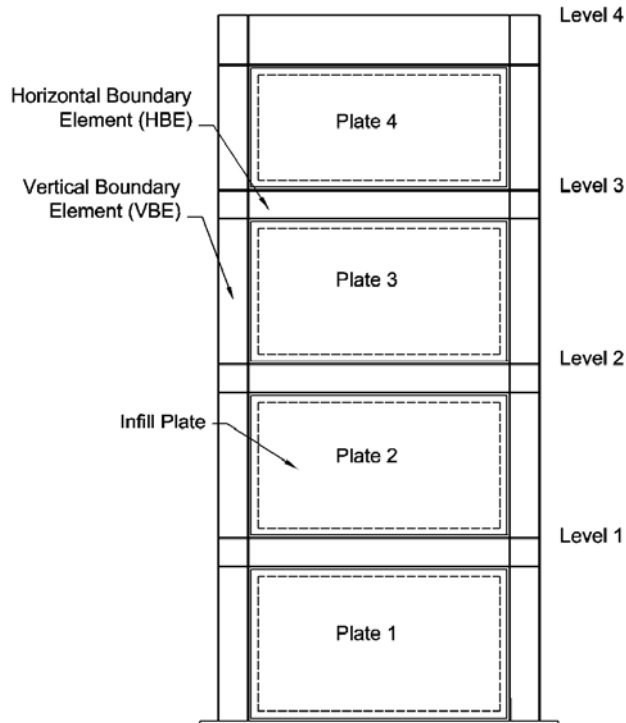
Schematic of Steel Plate Shear Walls (AISC 2010b)
